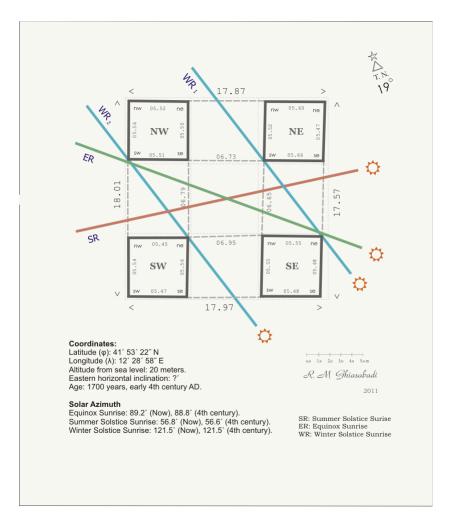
The floor plan and sightlines of Janus Tetrapylon
